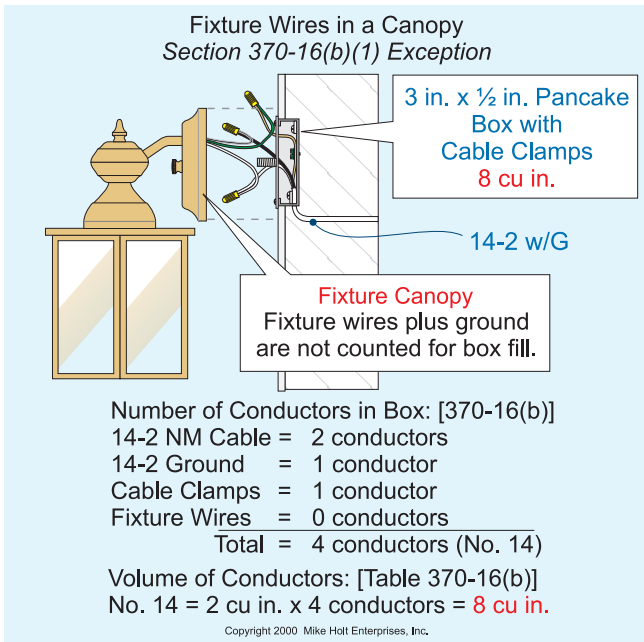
Box fill requirements when working with fixture wires in a canopy.
